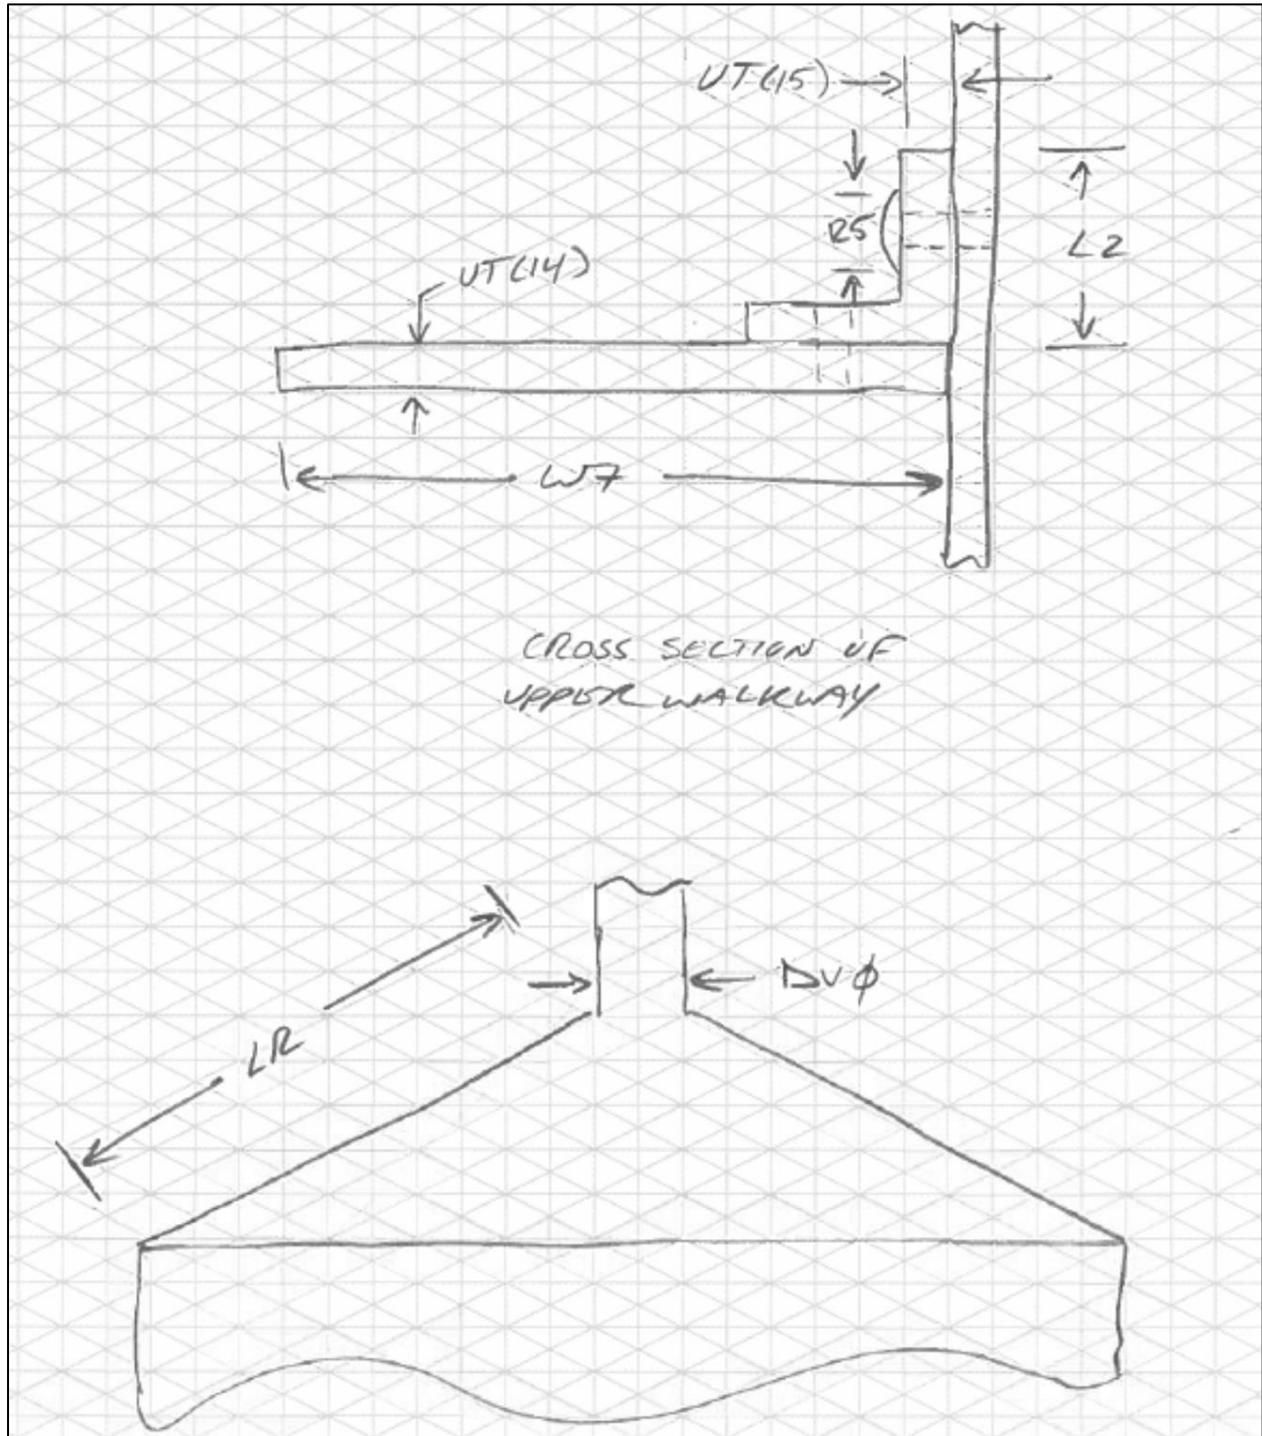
Example sketch of upper walkway platform dimensions – new sketch to be produced if missing dimensions/structural elements are observed at site. Dimensions and UT locations identified.
